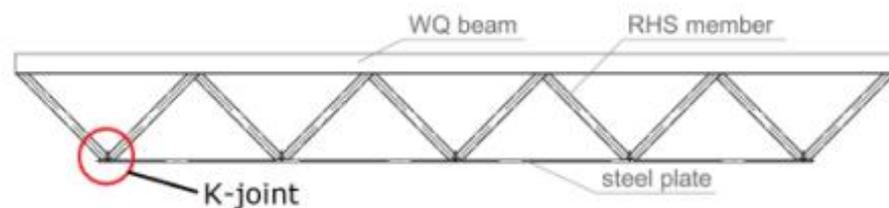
WQ-truss system (Kadak Jaak, Thesis, Effect of steel strength on the welded joint between a plate and two tubular cross-sections,2014)
